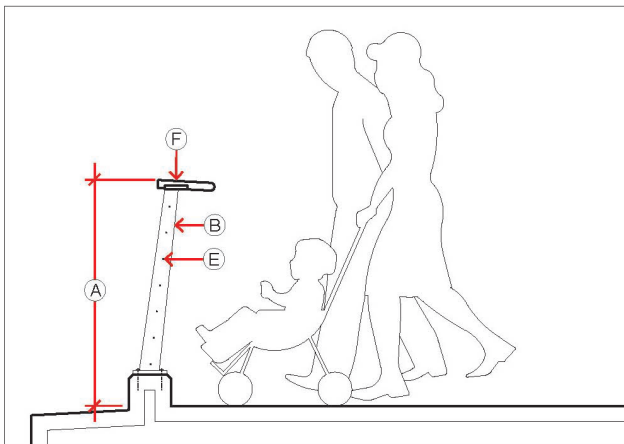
Pedestrian railing type 3 typical section
